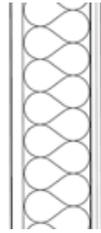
Example of a sandwich wall: two steel plates with a core of mineral wool.
